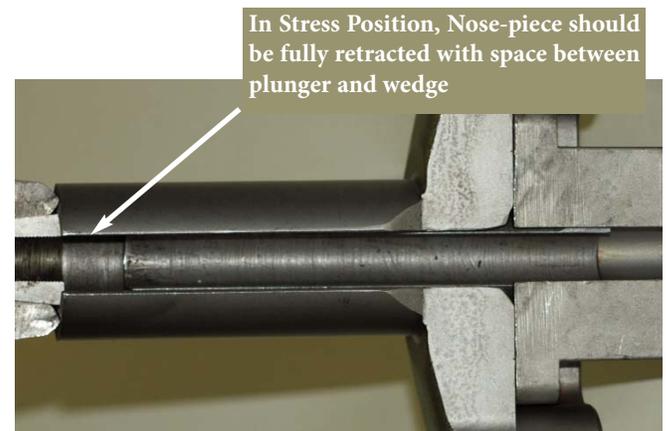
Check stressing jack to ensure that the wedge seating mechanism properly moves in and out.
